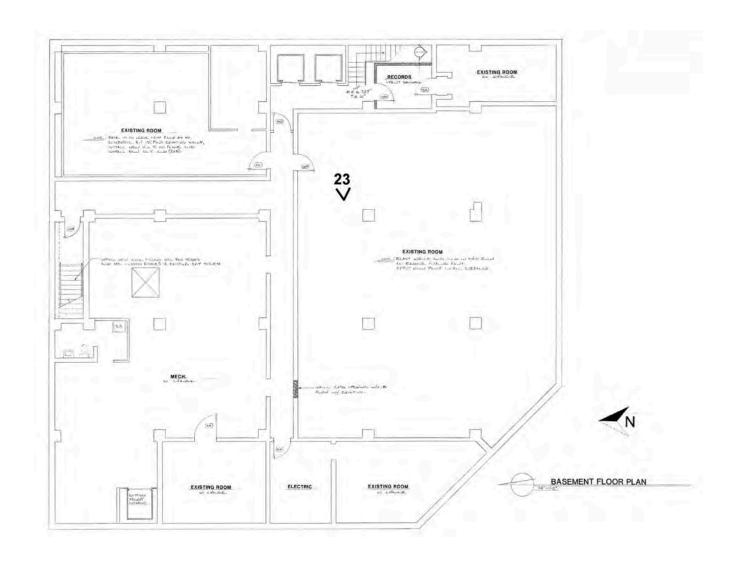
The Standard Building Floor Plan/Photo Key - Basement
